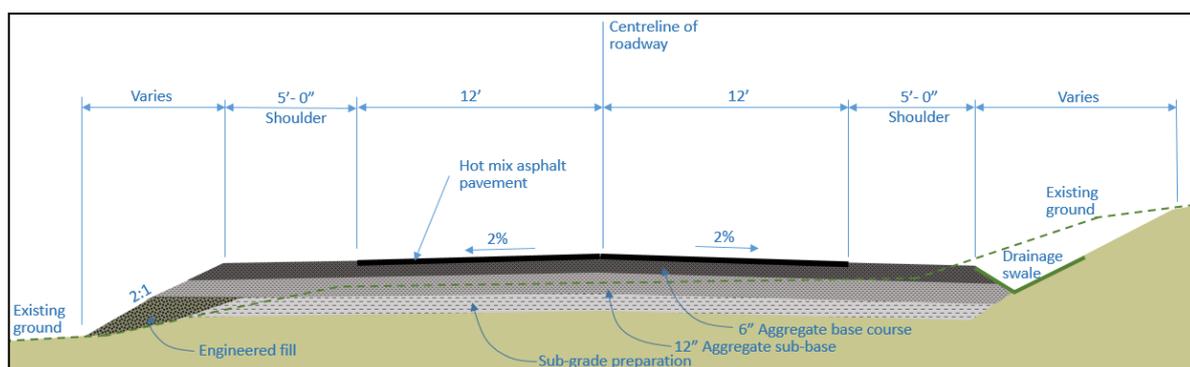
Typical road cross-section. Based on the design standard developed for Kosrae circumferential road extension project (Barret Consulting Group Inc., 1987). Source: Project Proposal Document.
